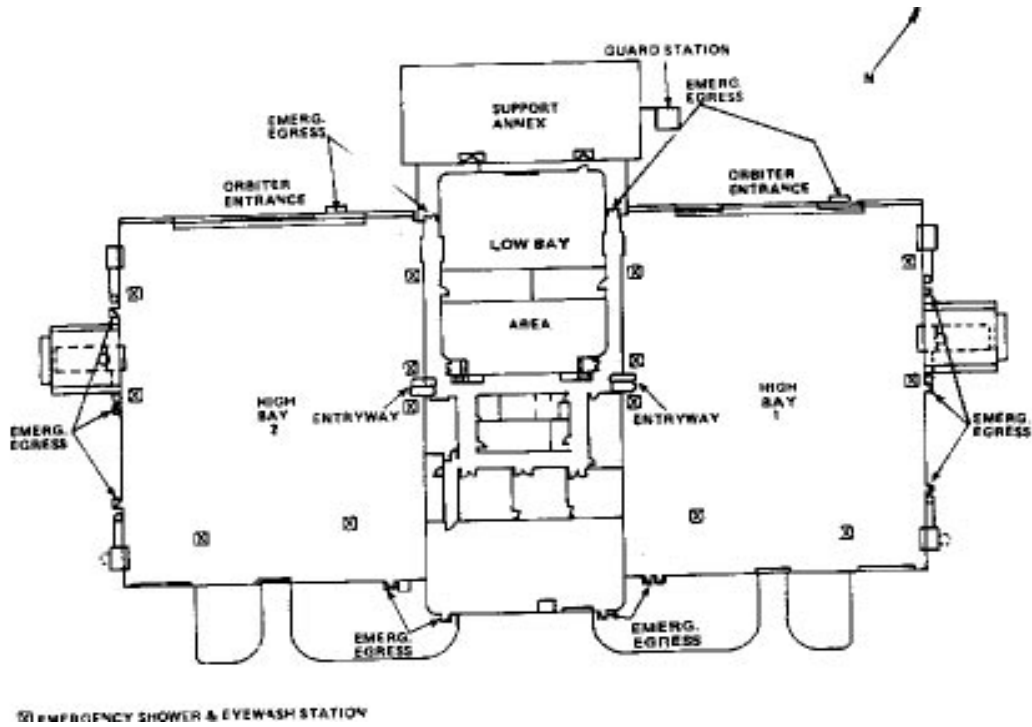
OPF General Layout Showing Access/Egress for High Bays 1 and 2
